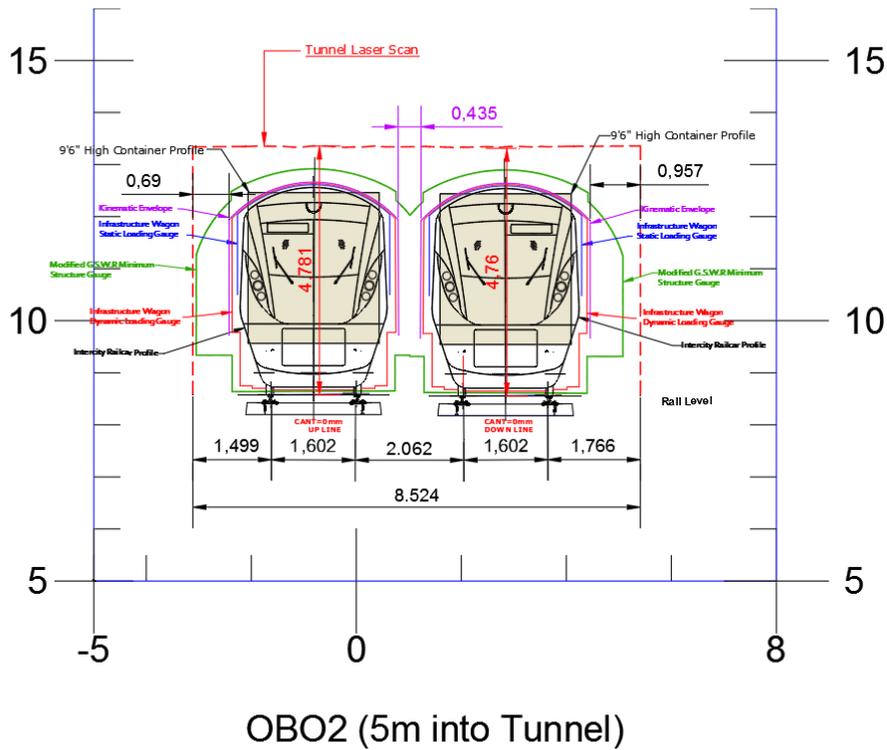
Track Cross Section under OB02 Conyngham Road Bridge at 5m into Tunnel
